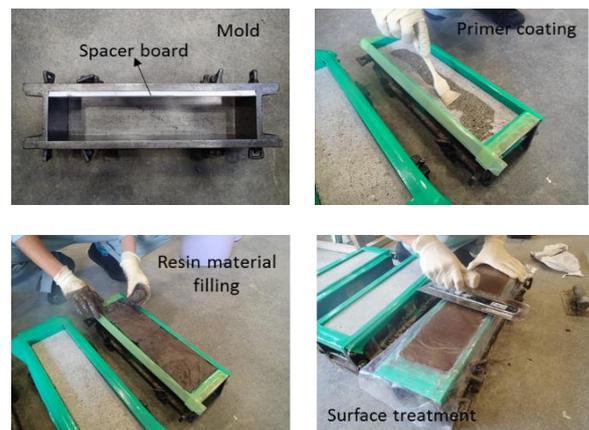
Manufacture of concrete specimen in the steel mold adhibited with set retarding sheet, the uncongealed mortar was removed by flowing water and steel wire brush. Before repairing the concrete base material, the adhesion interface of concrete base material was smoothed by the floating apparatus for concrete, the primer and adhesive were coated in turn, and then the resin repair material was filled into the mold. Finally, the surface treatment of concrete member was conducted. The detailed manufacture order was shown in Fig.3.
